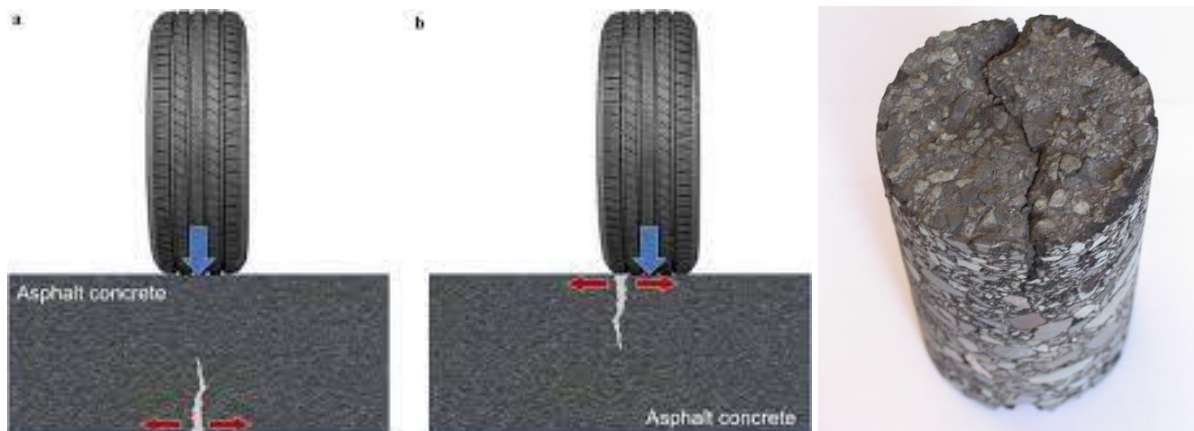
Illustration of different pavement cracking modes: (a) Bottom-up cracking mode, (b) Top-down cracking mode, and (c) Core sample showing a typical top-down cracking profile.
